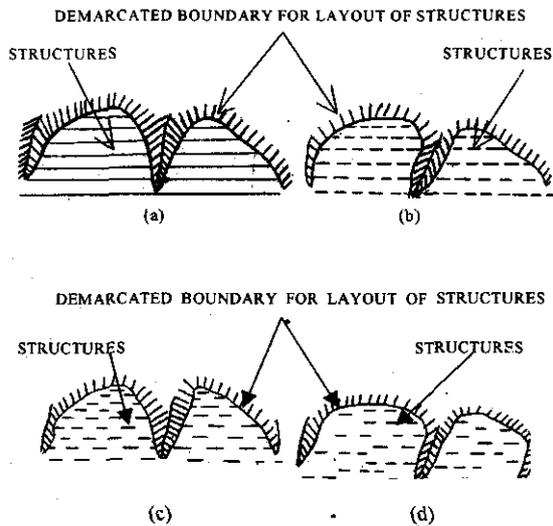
Plan showing (a) continuous arrangement of structures, (b) interrupted arrangement of structures, (c) staggered discontinuous arrangement of structures, and (d) combination of discontinuous arrangement of structures.
